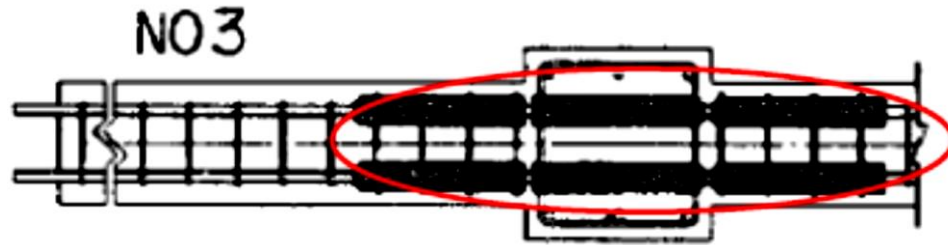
Grouted Couplers in Beams and Beam-Column Joint Tested by Matsuzaki et al. (1987b)
